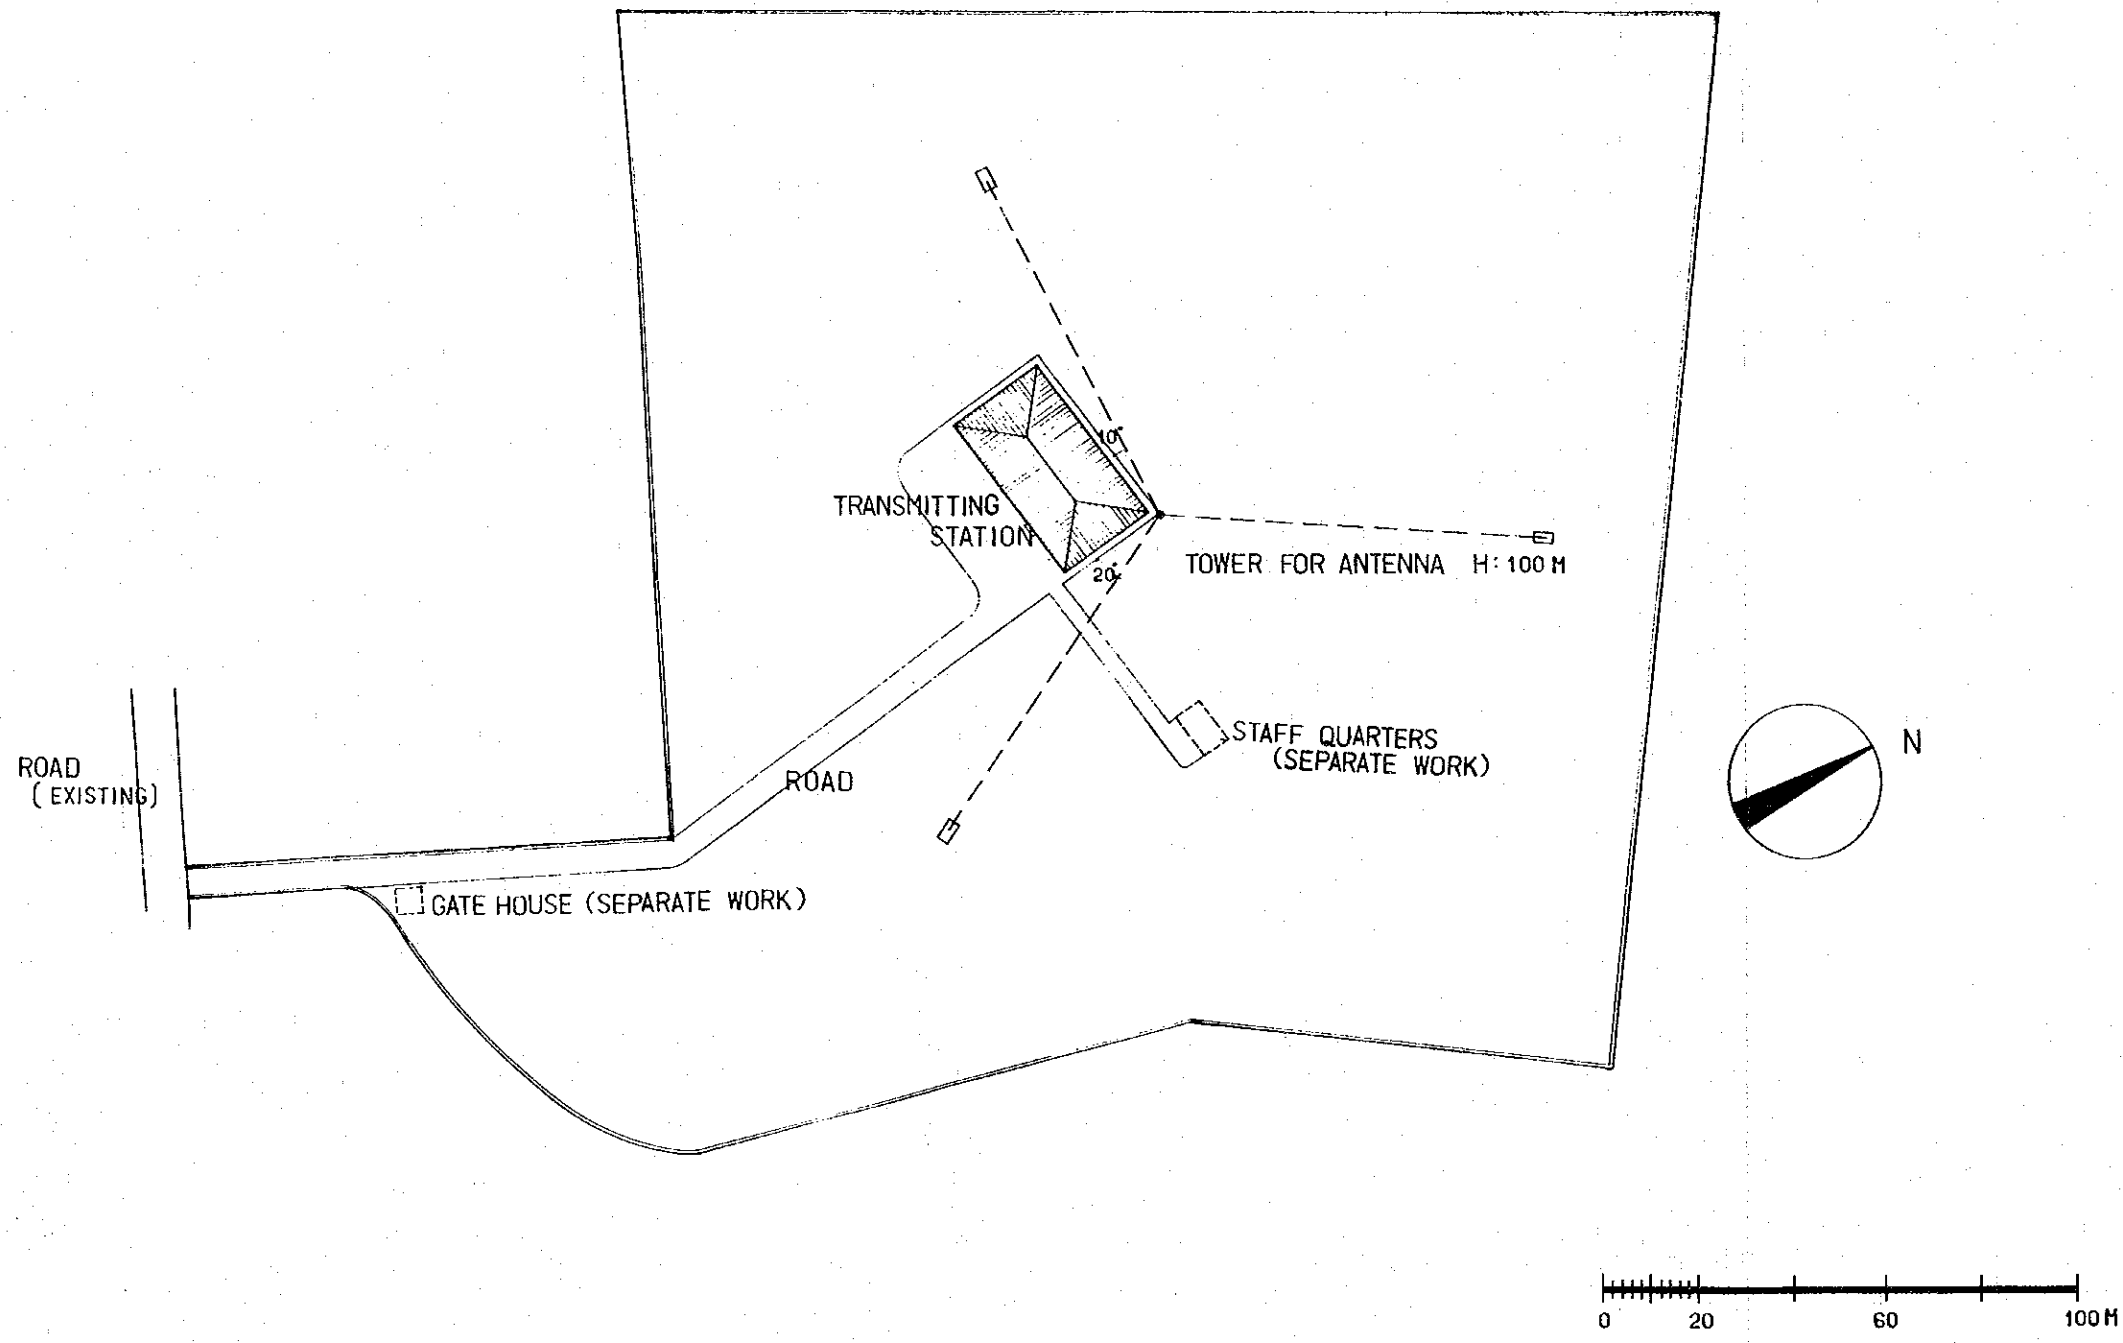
SITE PLAN — POKHARA TRANSMITTING STATION
